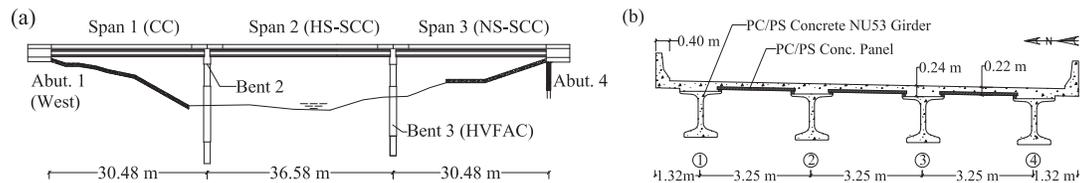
Bridge A7957. (a) Elevation. (b) Cross-section.
